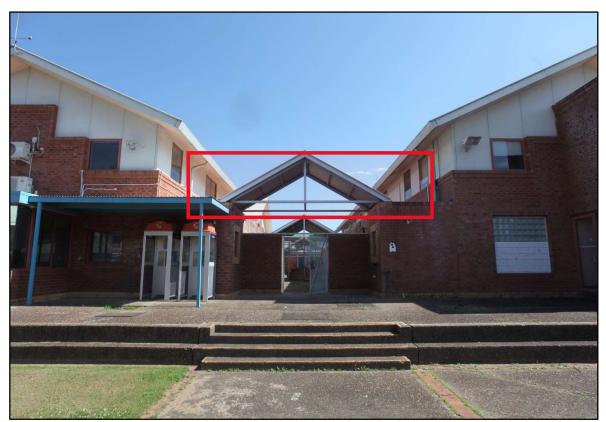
View of the link between Block A and Block B – indicative area of new link bridge
